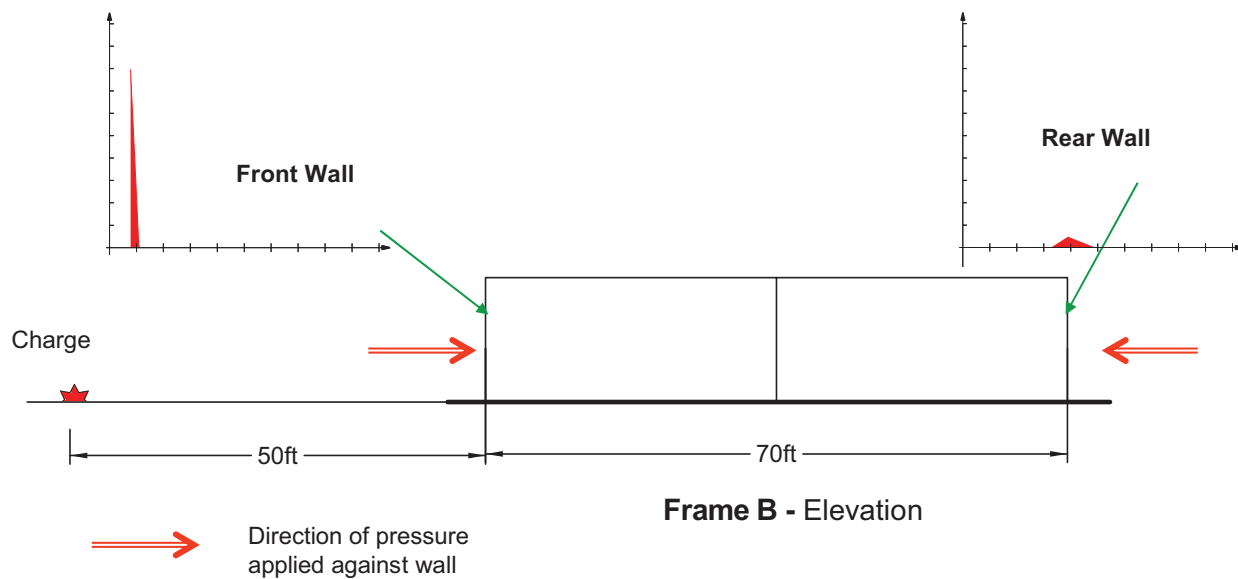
Schematic of loading pressure interaction on Frame B.
